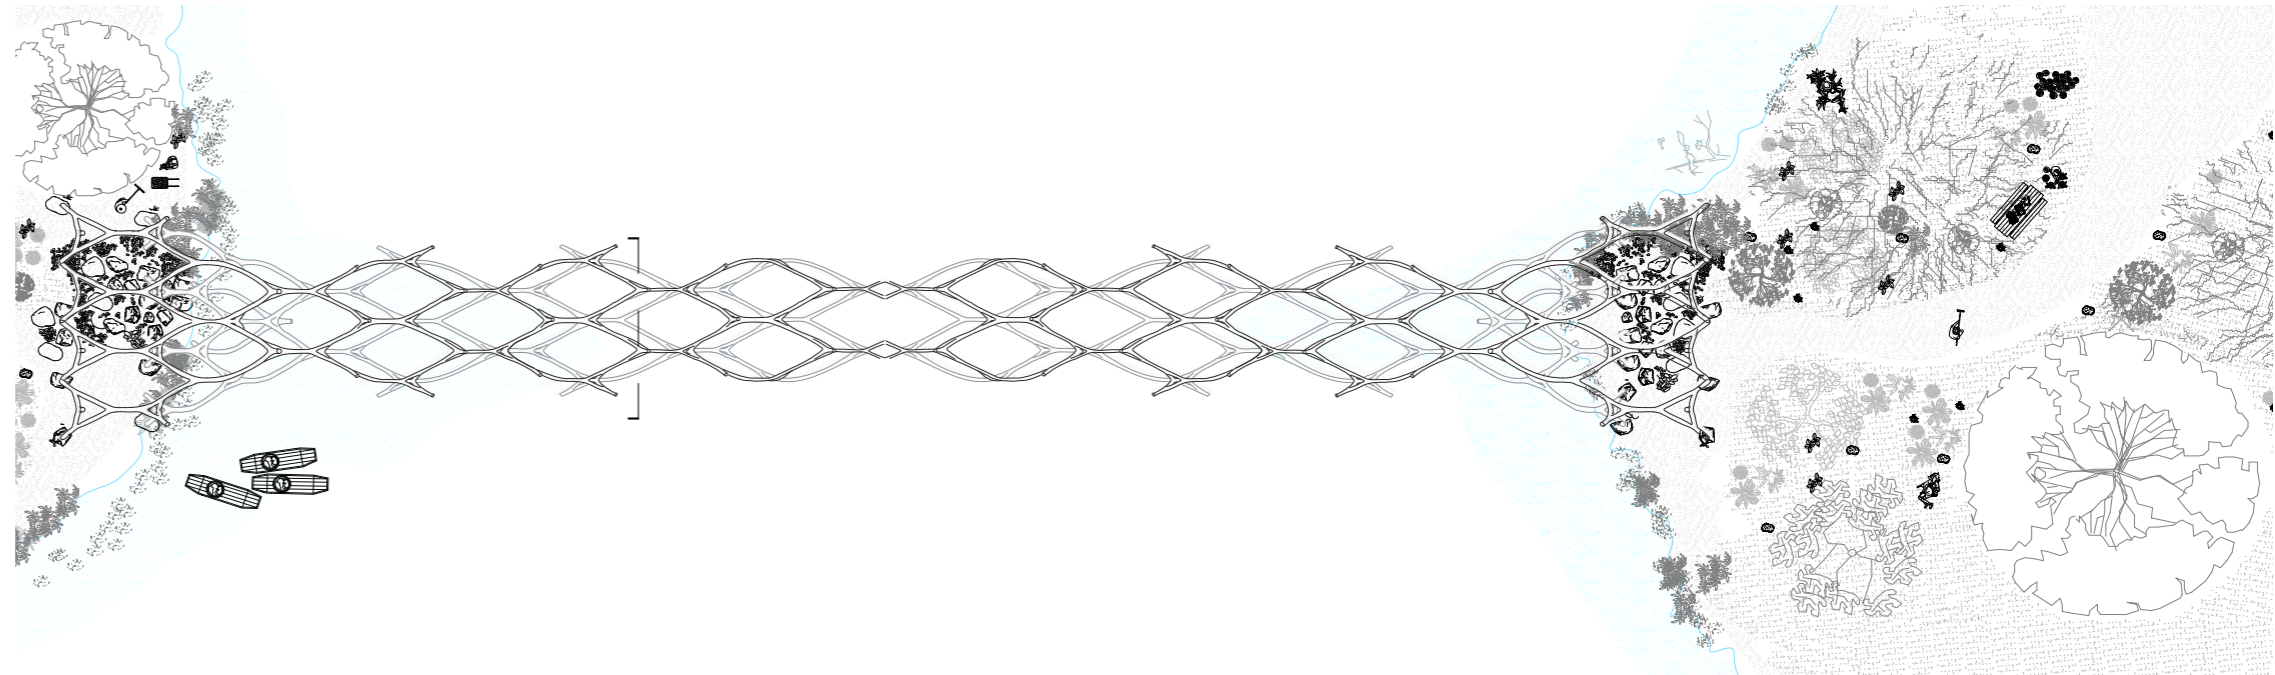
Plan of timber bridge spanning over quarry lake | Nolan | 2023
